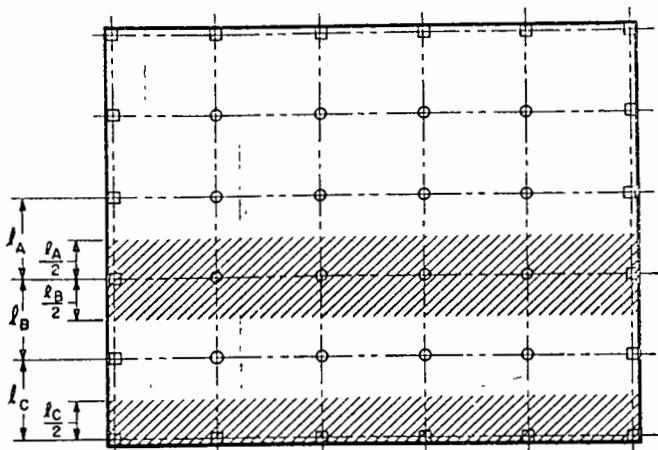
Area to be considered as equivalent frame under Section 13.4
